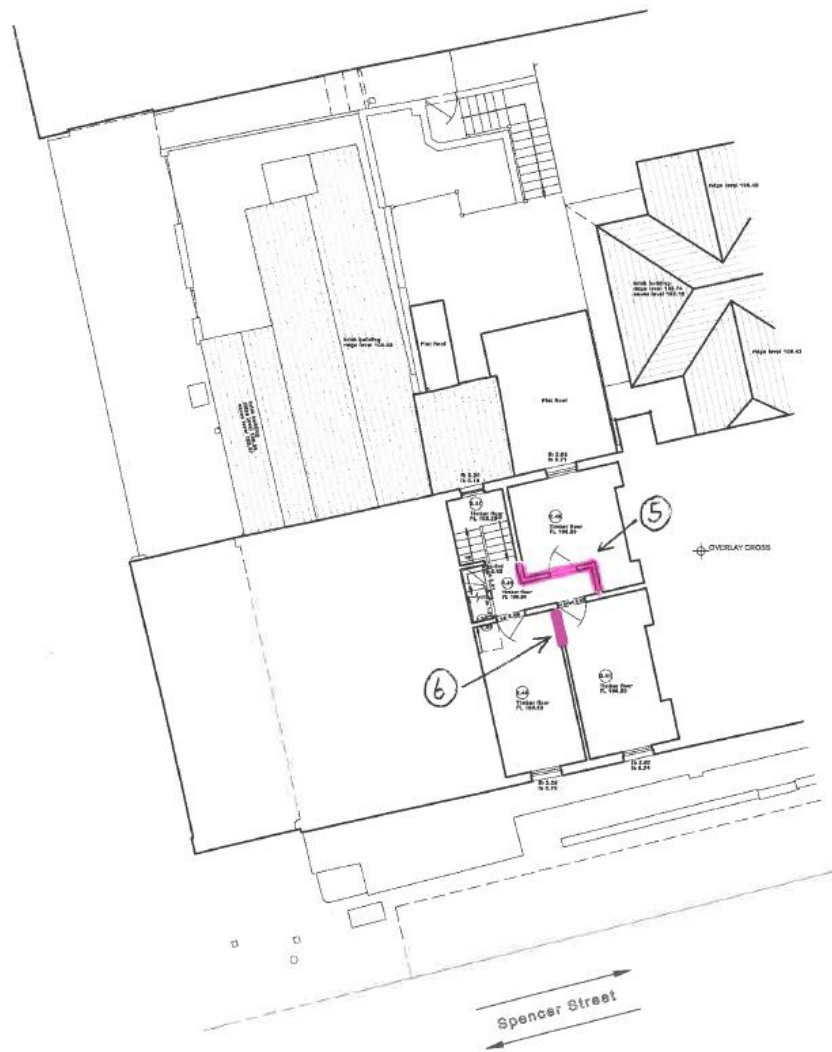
Second Floor Plan, showing work items 5 and 6, as listed in the table in Section 7.1
